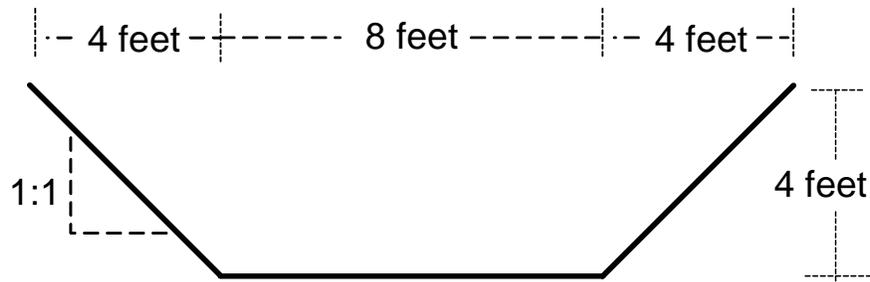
Typical cross section showing a 1:1 side slope on both banks. This would be a typical cross section shape for the pilot channel. Not all channels will be 4 feet deep.
